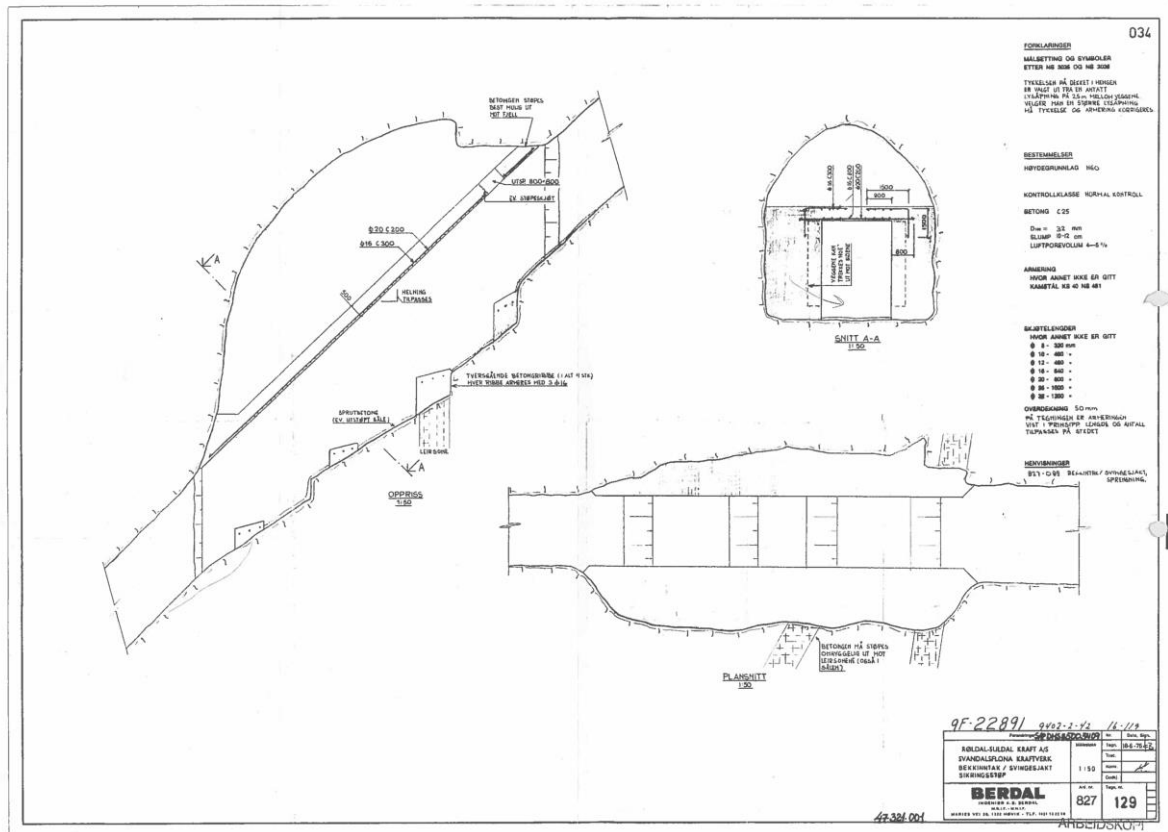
Construction drawings of the concrete lining in the shaft where the weakness zone intersects (Berdal AS, 1978b).
